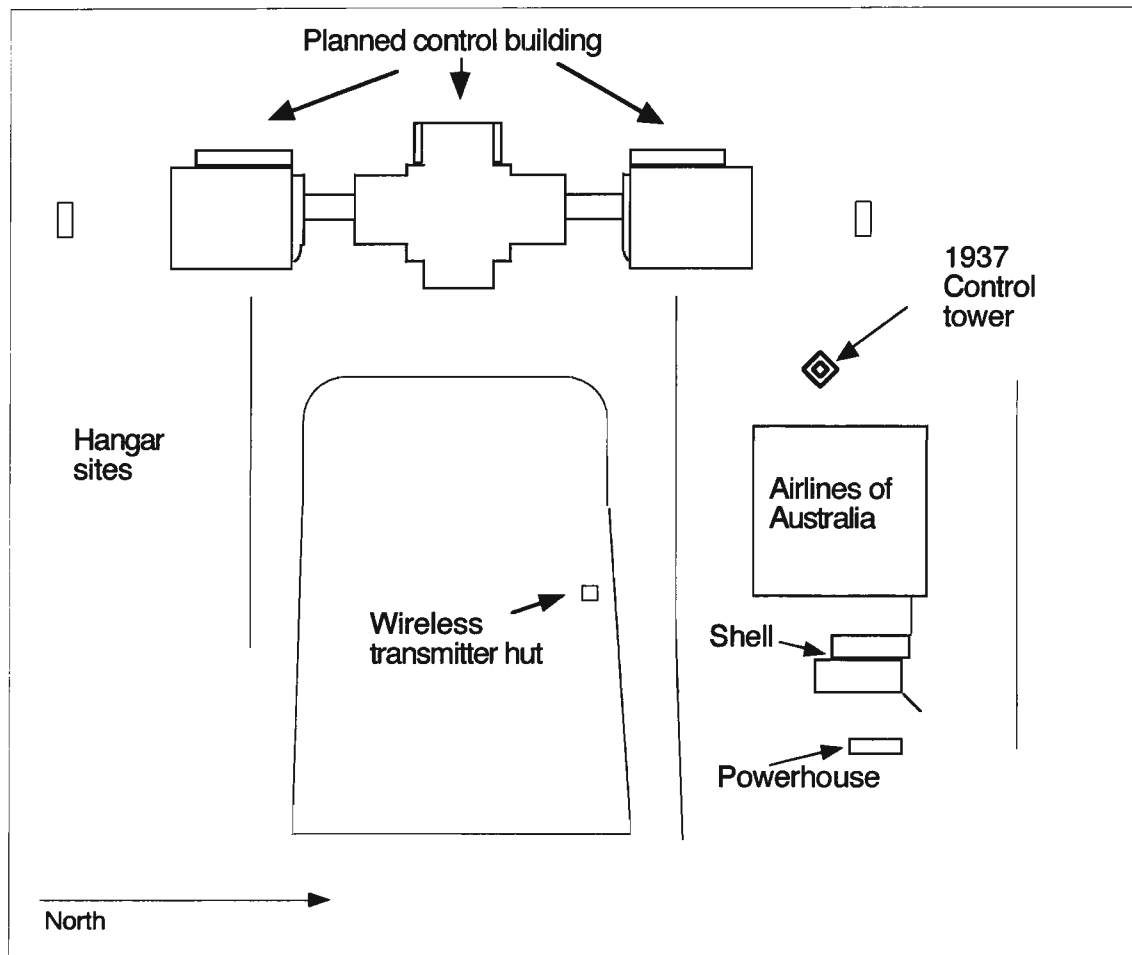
Copy of building and road layout, Archerfield 1938, which showed how its control building was expected to be constructed.
